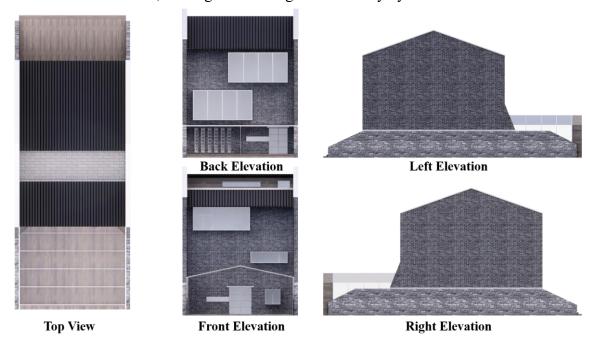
The Top View and Four Elevations of Sample Building (Drawn by the author)
